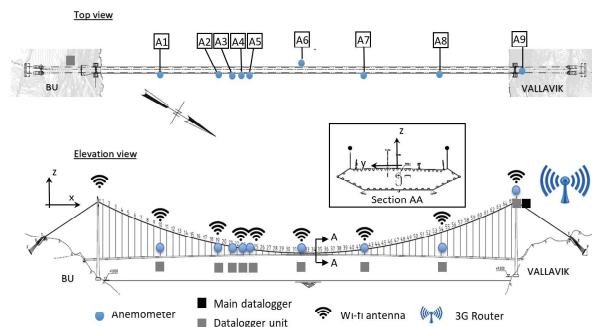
Overview of the full-scale wind measurement system at the Hardanger Bridge
